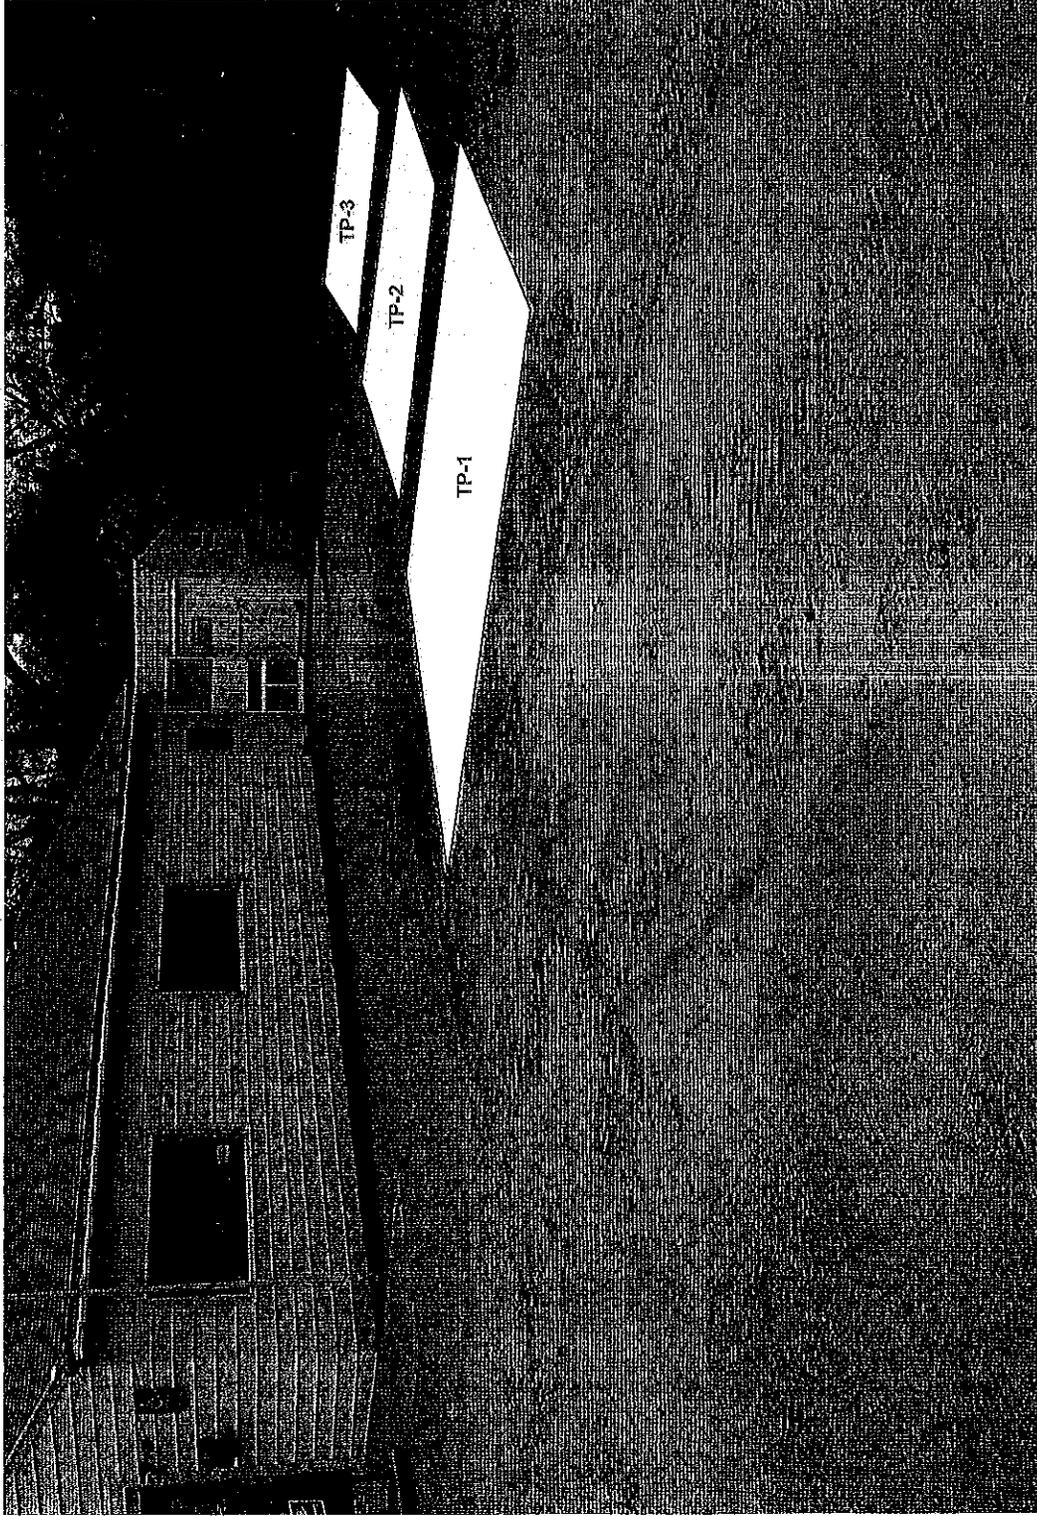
View of test pits, looking south. Only three test pits could be installed due to the space constraints of the property.
